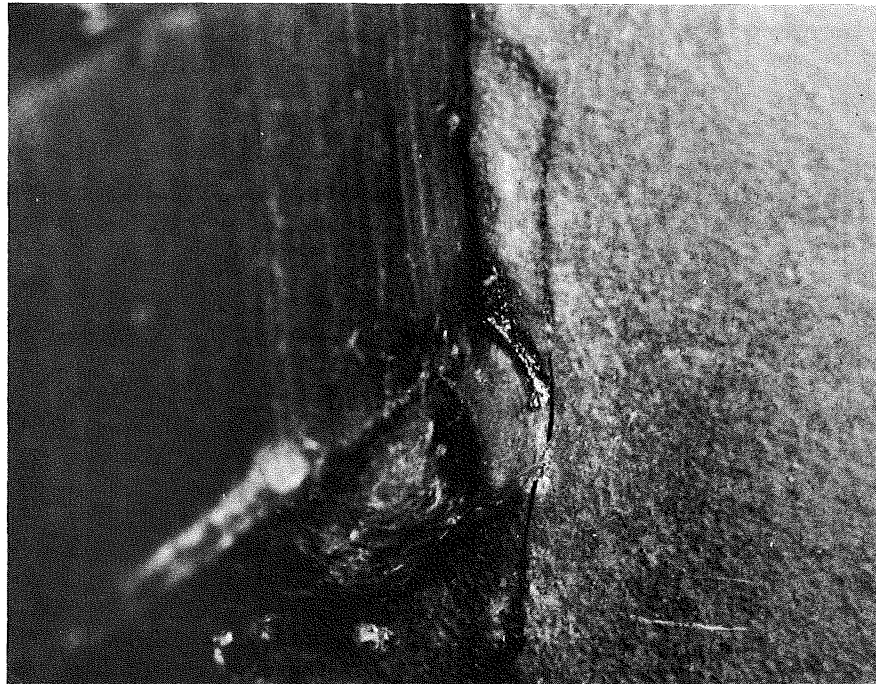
Typical Surface Crack at Weld Toe
